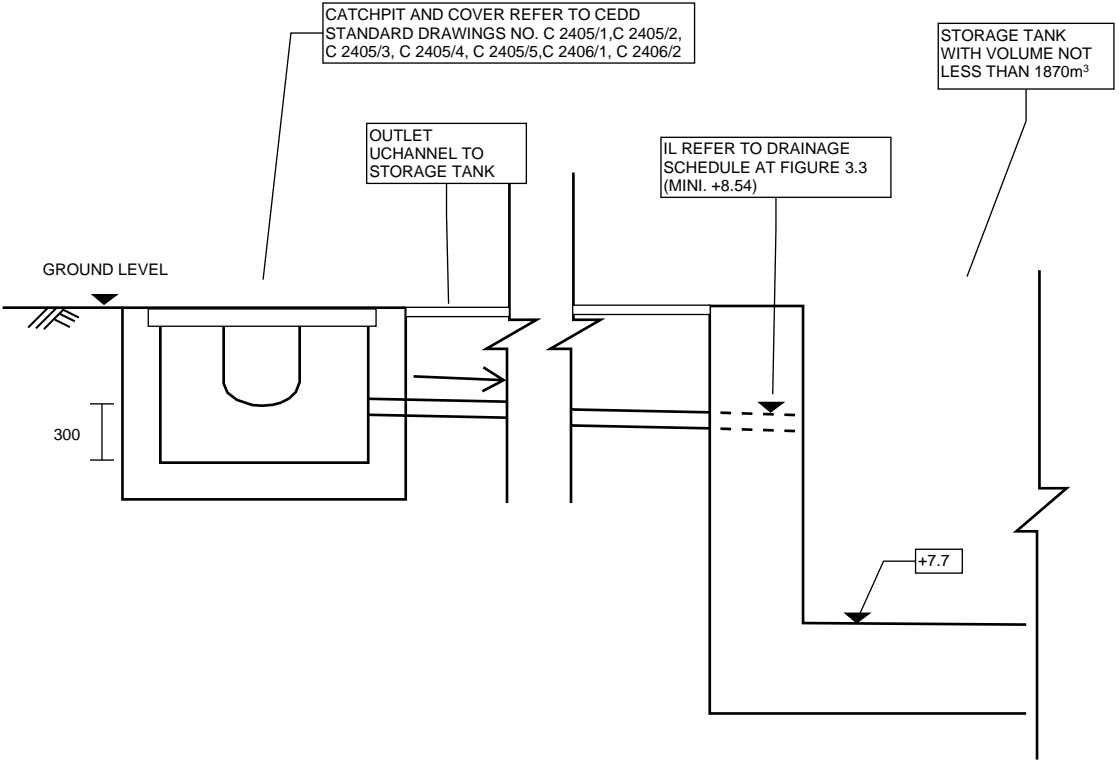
DETAIL OF OVERFLOW PIPE FROM STORAGE TANK
